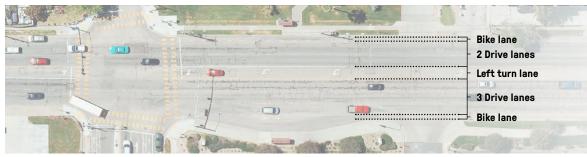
WILLIAMS ROAD AND BARDIN ROAD - EXISTING CONDITIONS
